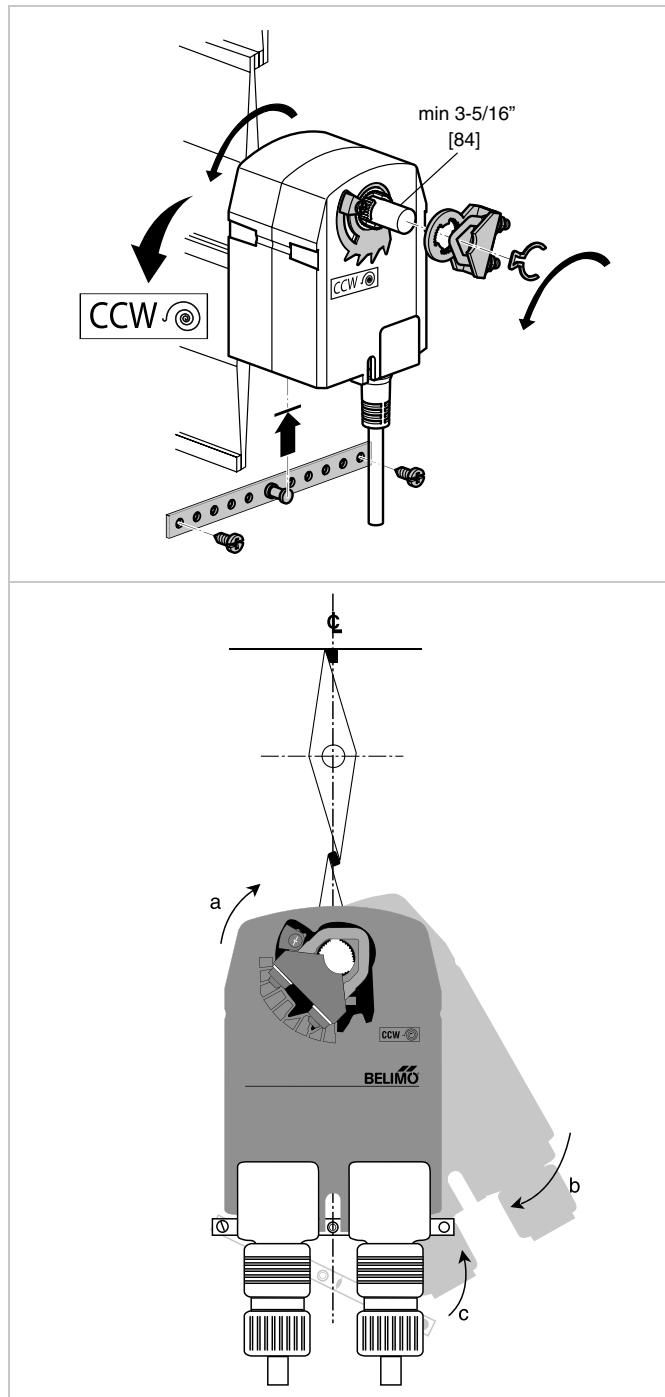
FIGURE B – Standard Mounting (Dimensions in Inches [mm])
